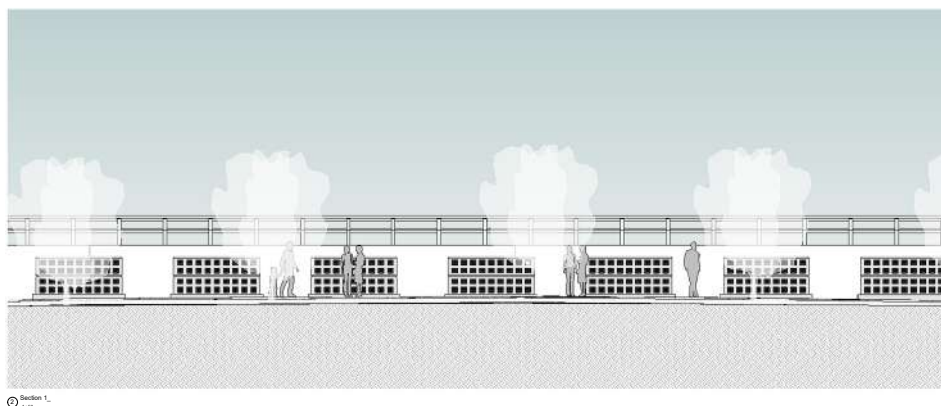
Elevation of proposed columbarium walls July 2023 (Source: Taylor Brammer Landscape Architects)
